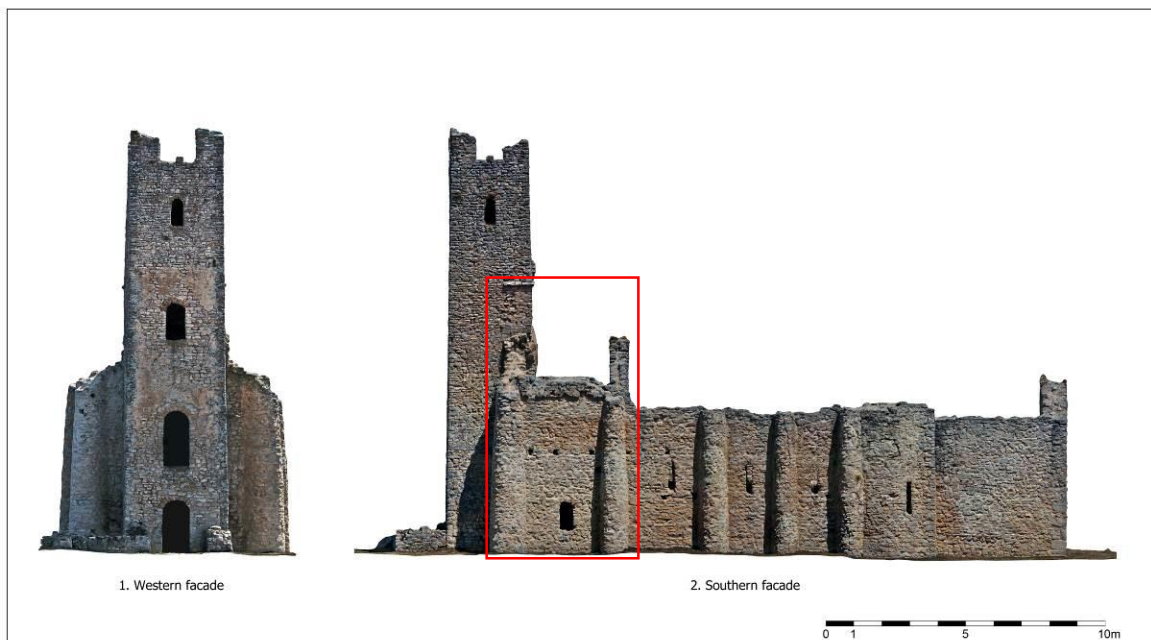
Church of the Holy Salvation, Cetina. Orthophoto plans
